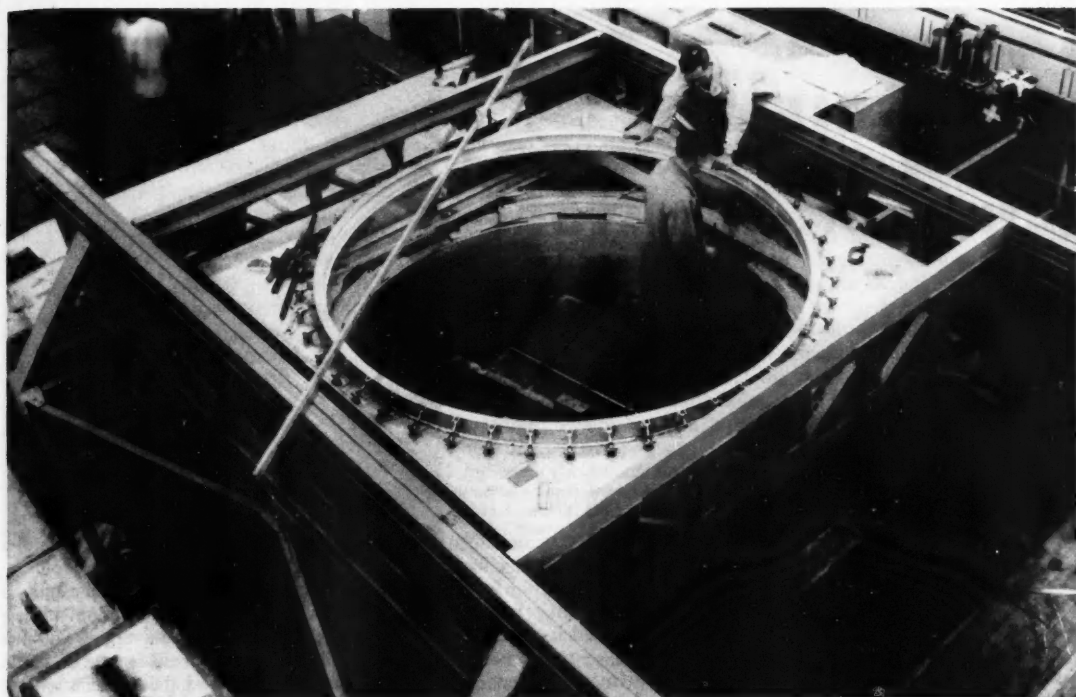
DIMPLE, Britain's first heavy-water pile under construction at Harwell.
